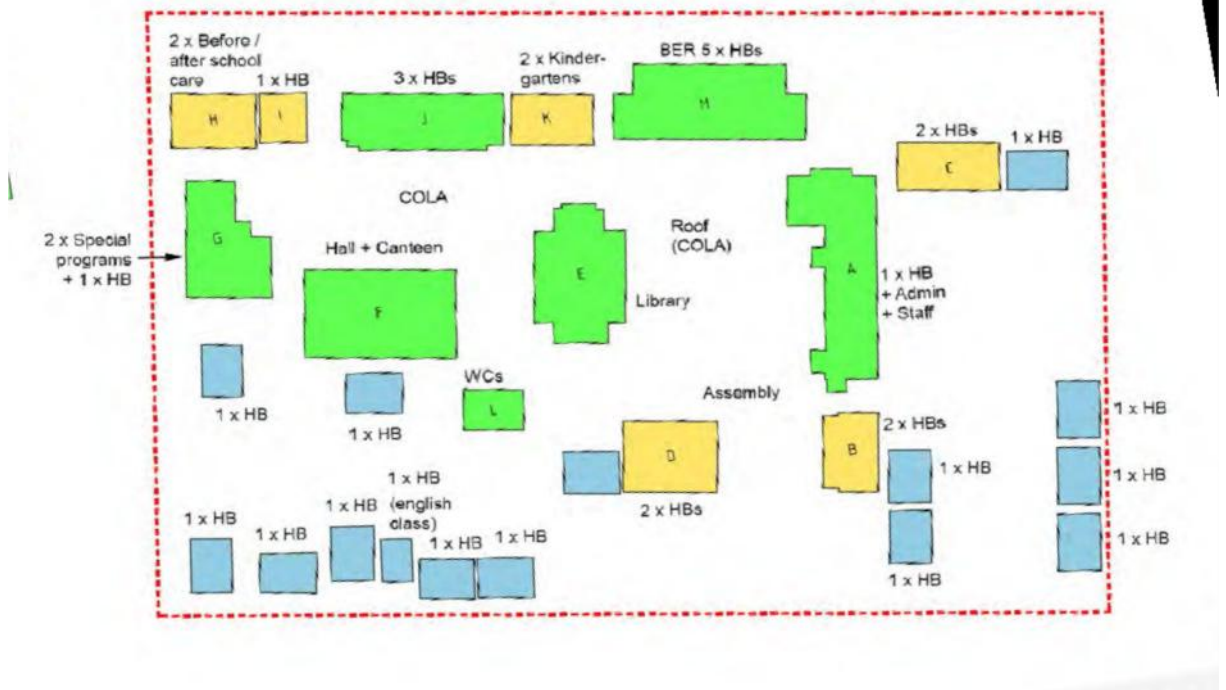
Existing building plan showing permanent structures – source Design Development report)
